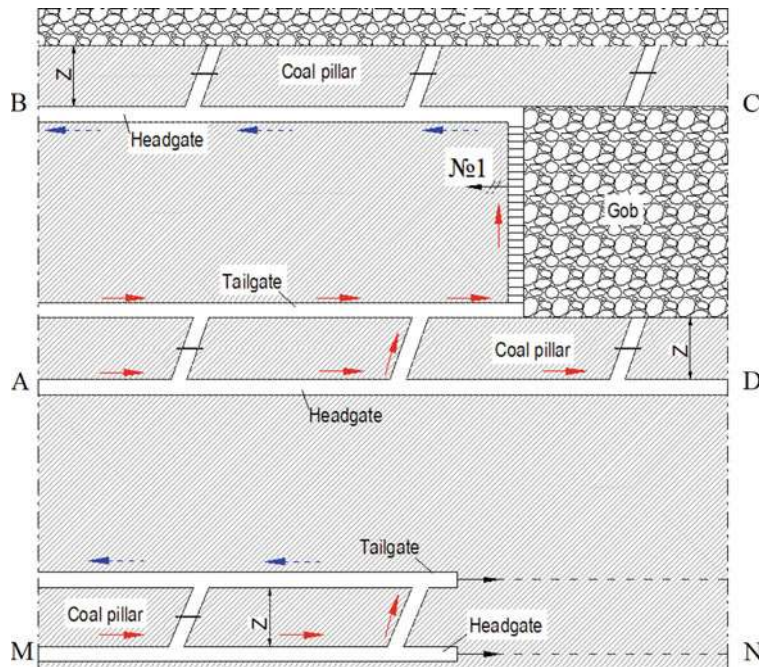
Plan of longwall mining system applied in underground coal mines in Vietnam
